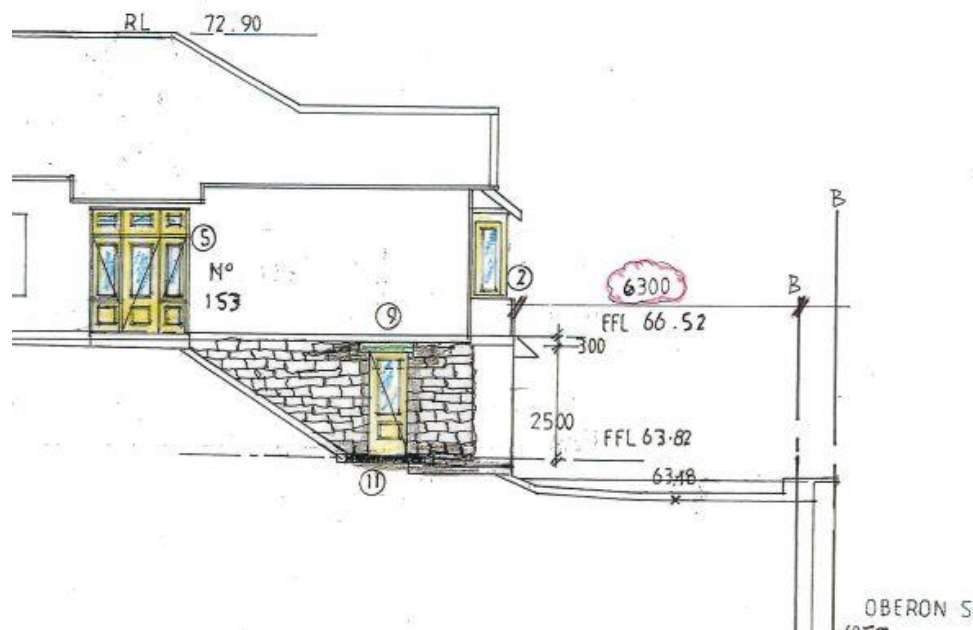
Proposed west elevation (Source: John Normyle Pty. Ltd.)
